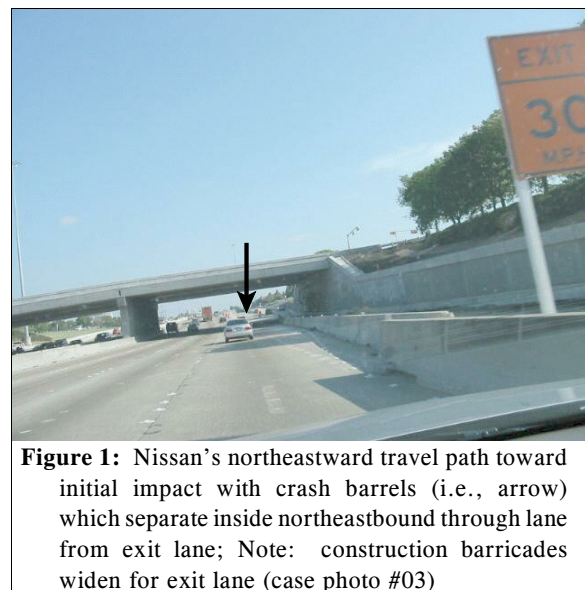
Nissan's northeastward travel path toward initial impact with crash barrels (i.e., arrow) which separate inside northeastbound through lane from exit lane; Note: construction barricades widen for exit lane (case photo #03)
